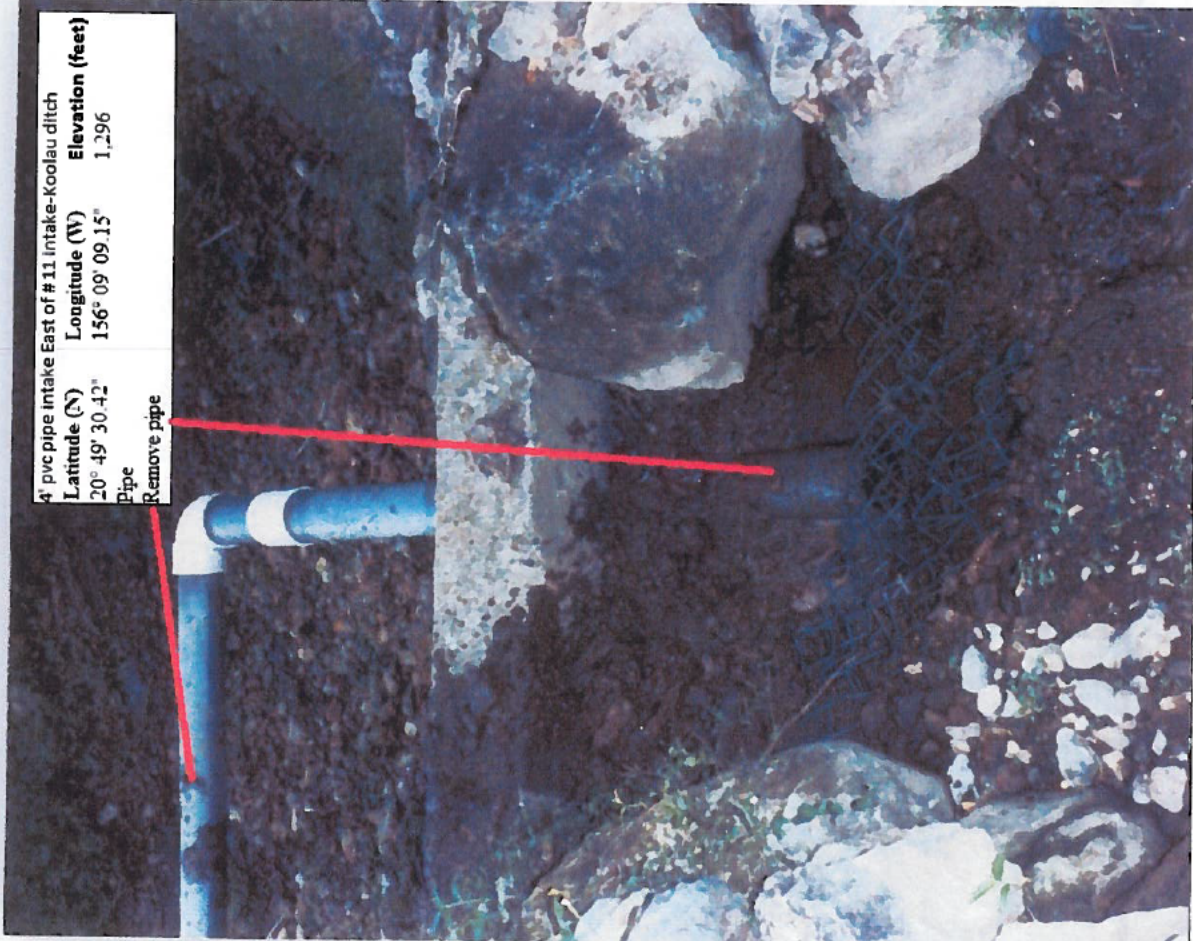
Waioakamilo #11 Intake at Koolau Ditch (K-23/329.6)
